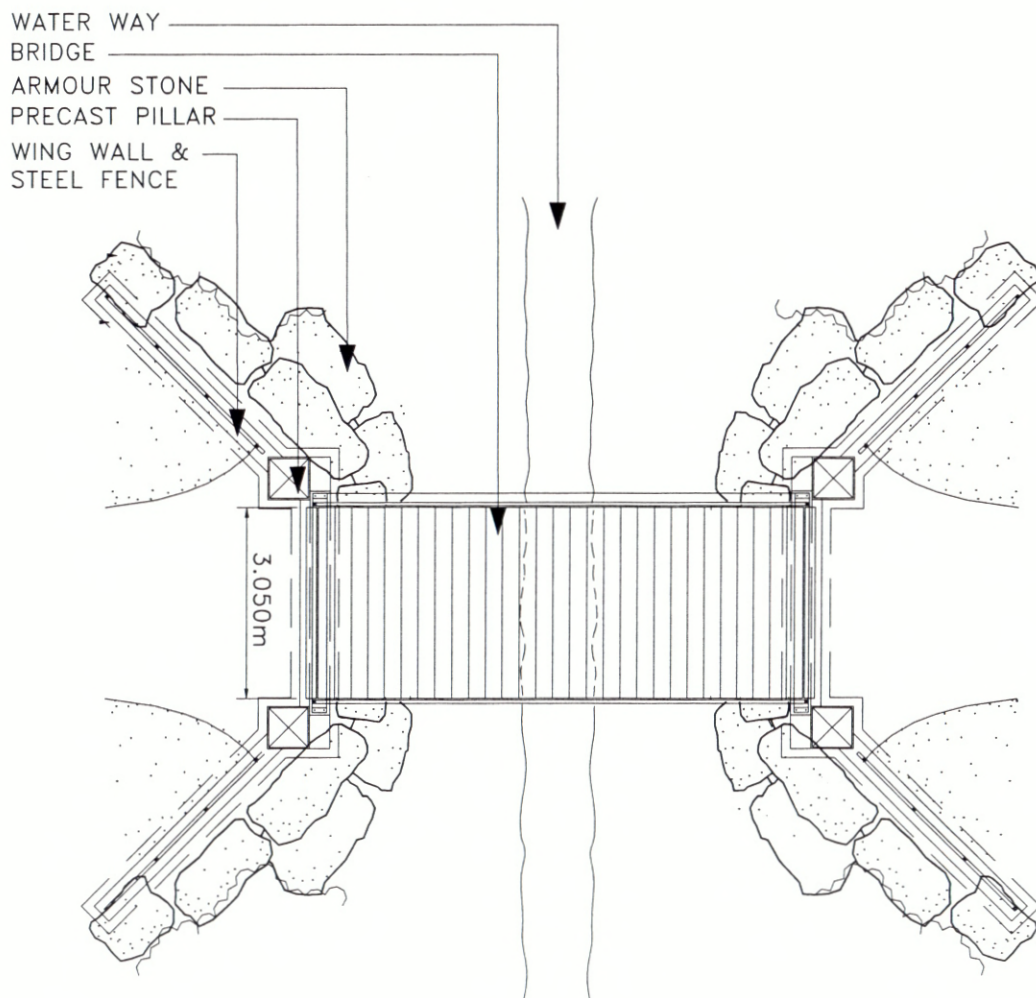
TYPICAL PLAN OF PEDESTRIAN BRIDGE N.T.S.
